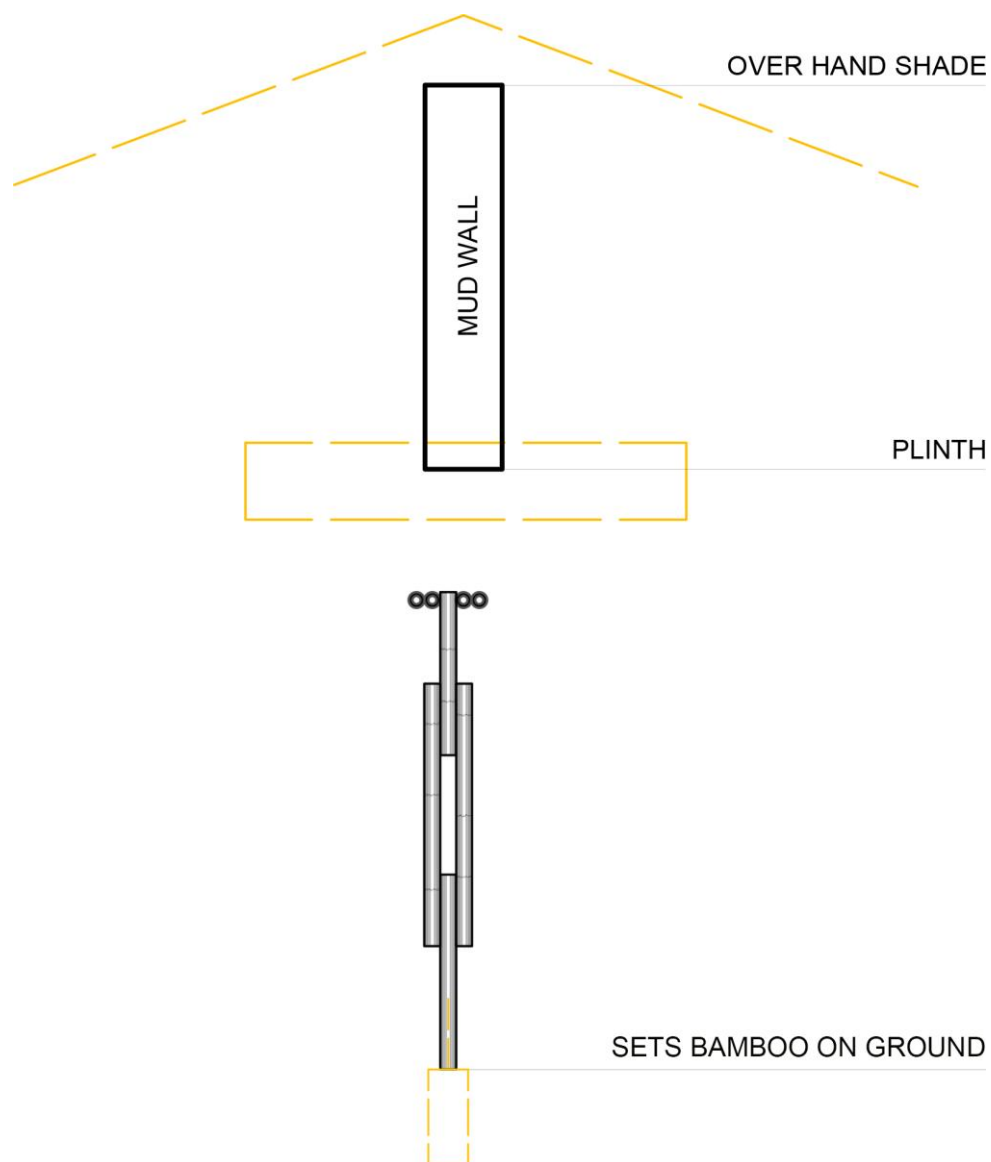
Protecting mud-wall and Bamboo; Source: Aneeka Habib, 2016
